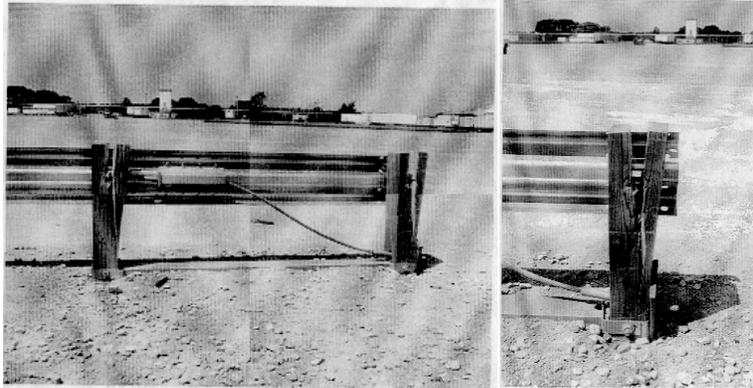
Guardrail terminal damage during test NEC-1.
